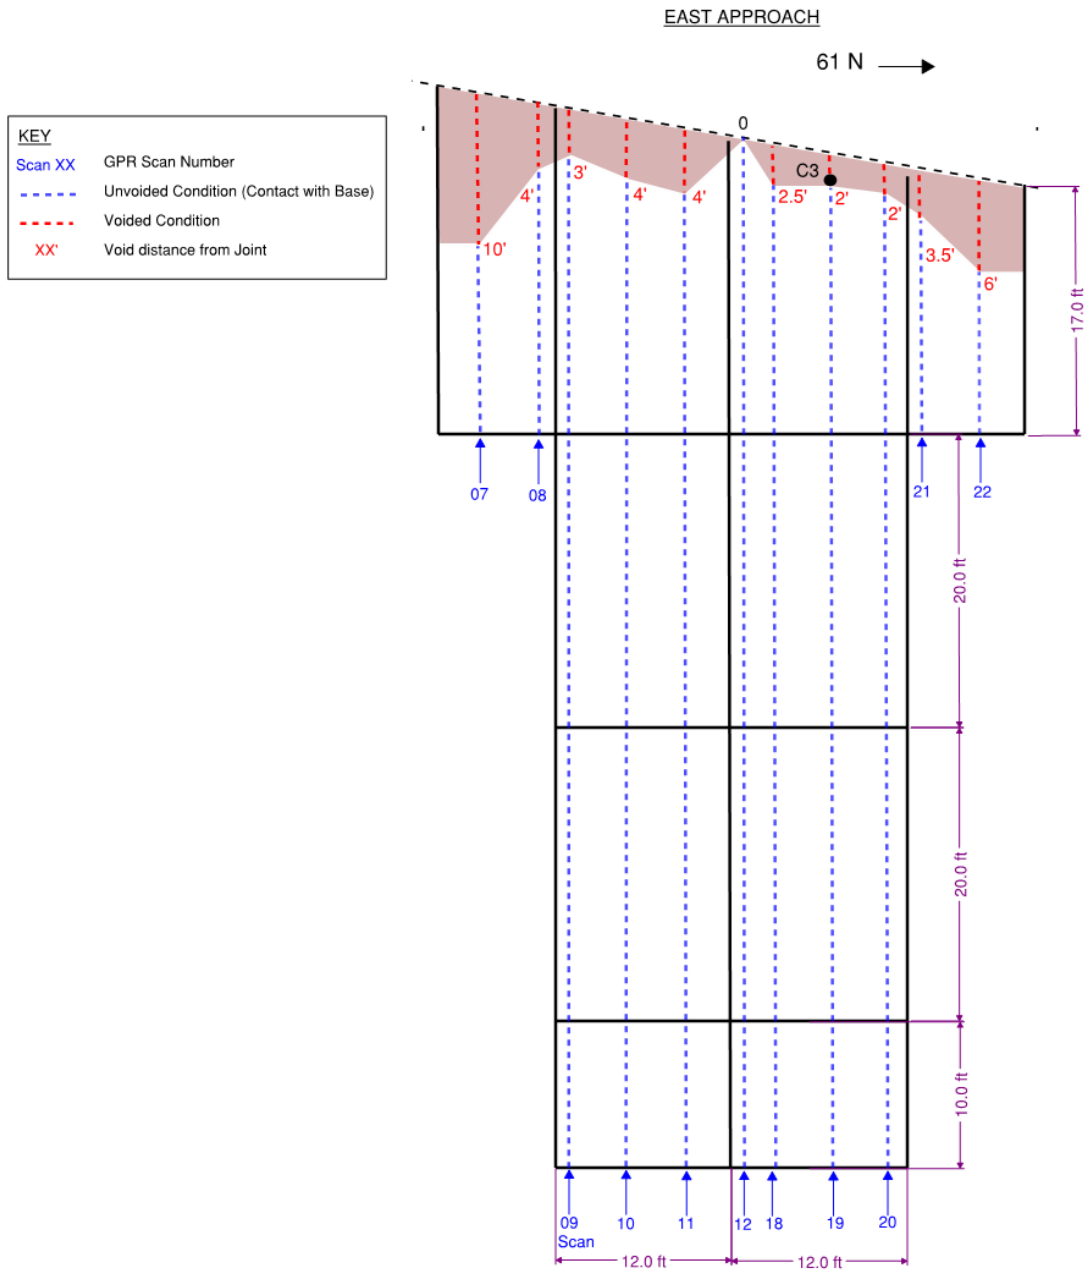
GPR results and core locations for east approach of Bridge 5624.20061.
